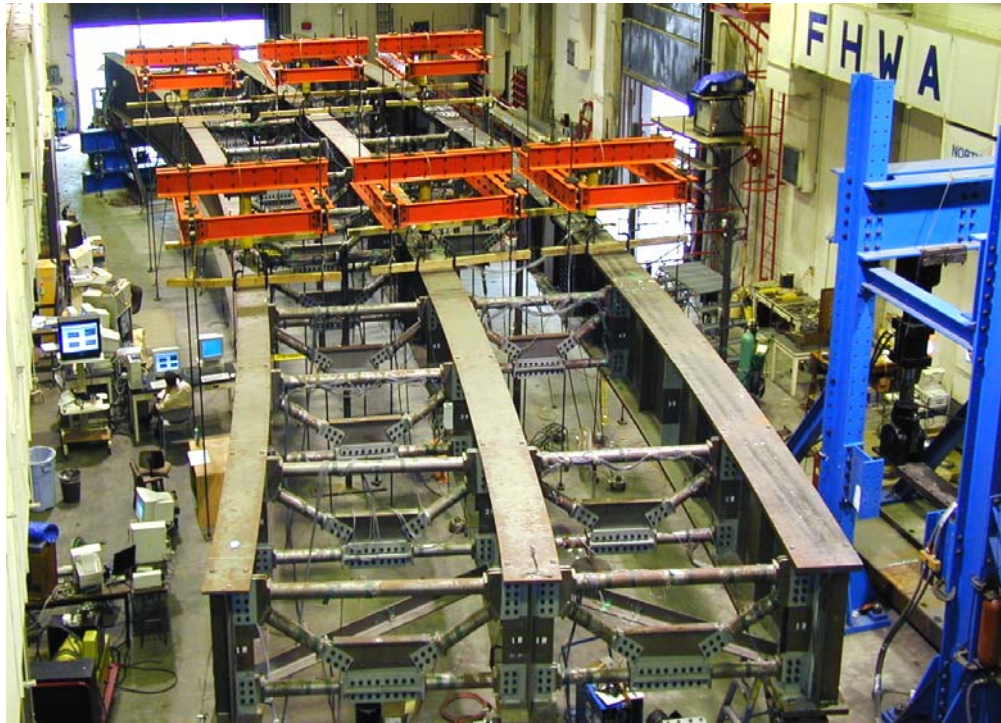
Overall view of uniform major-axis bending test, courtesy of FHWA.
